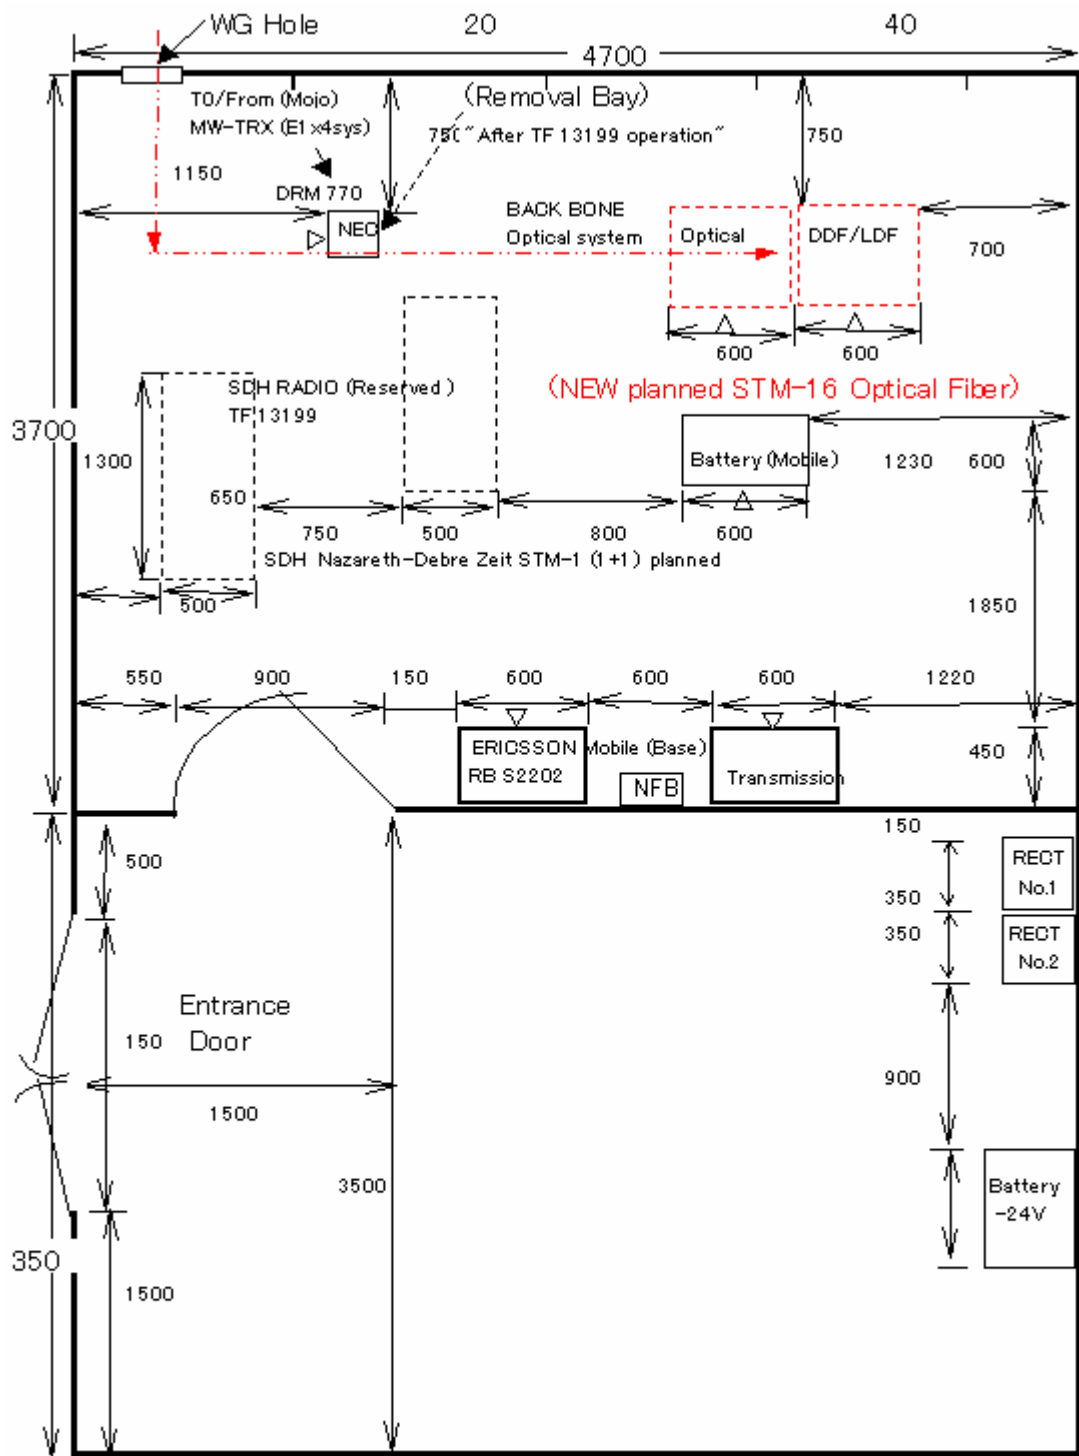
RADIO/MUX / POWER ROOM Planned Installation Place (Debre Zeit)
